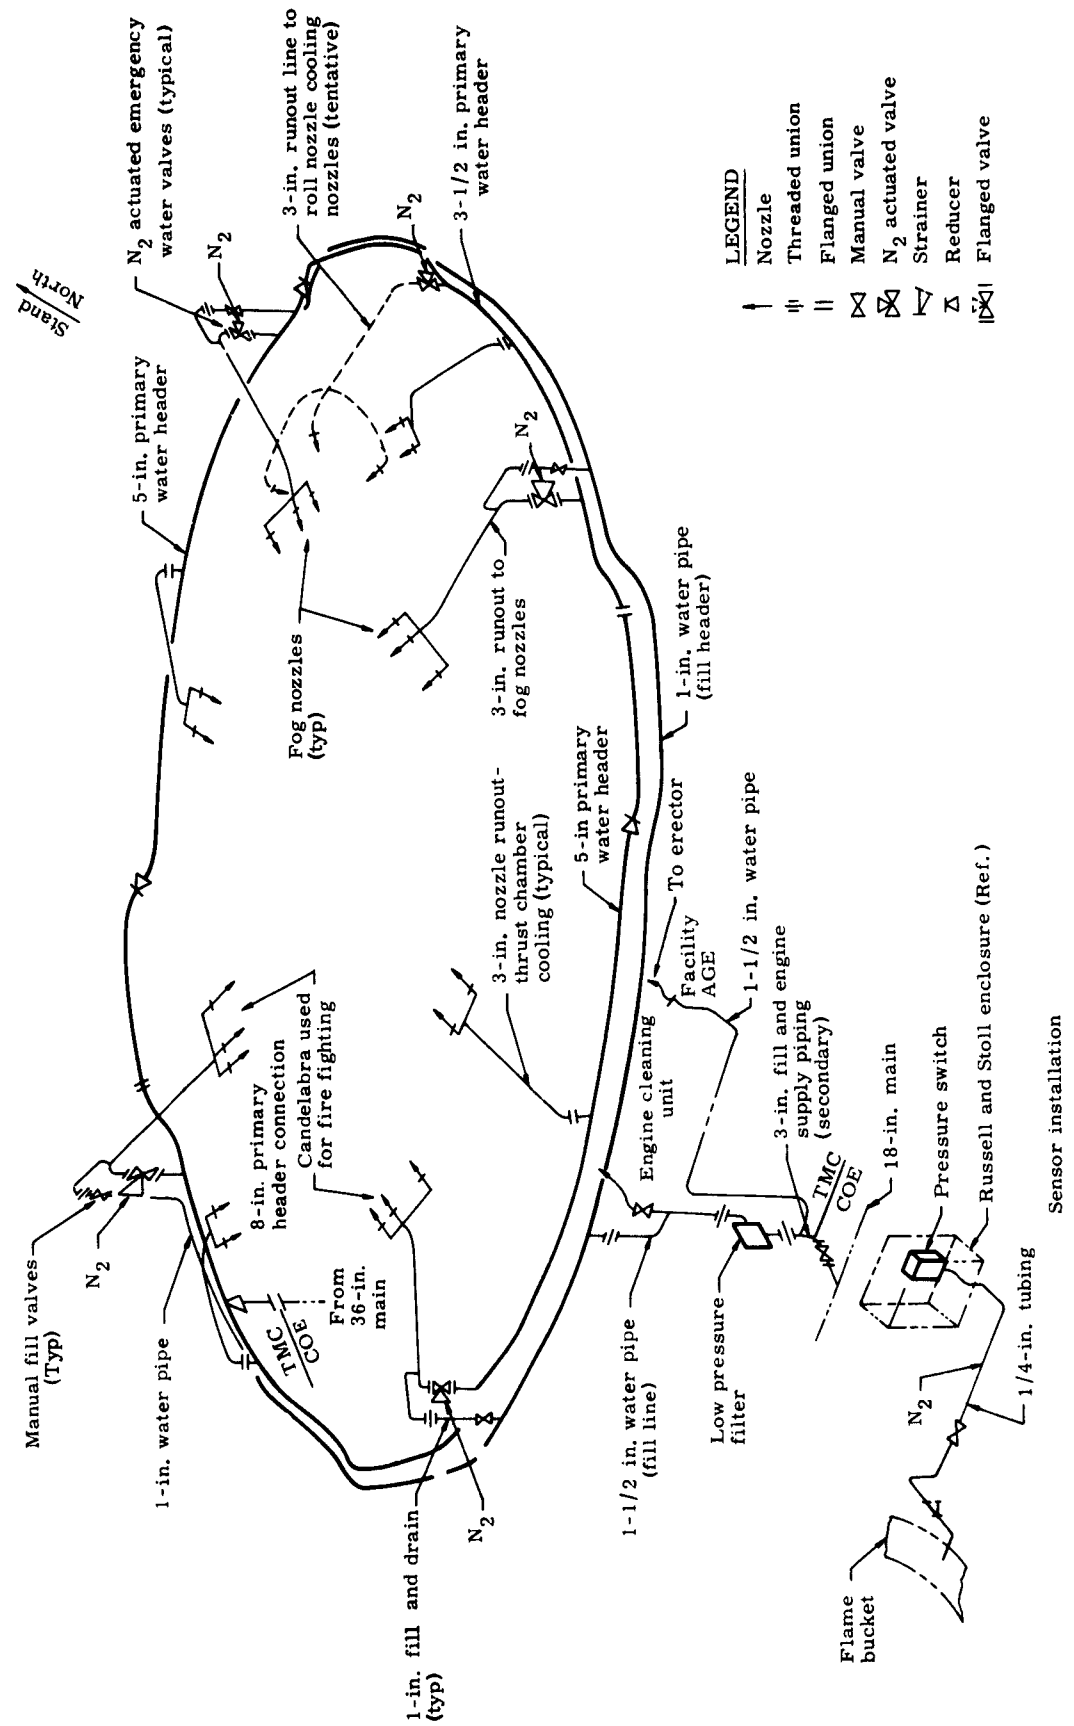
Piping Installation Water System Test Stand, Stage II
